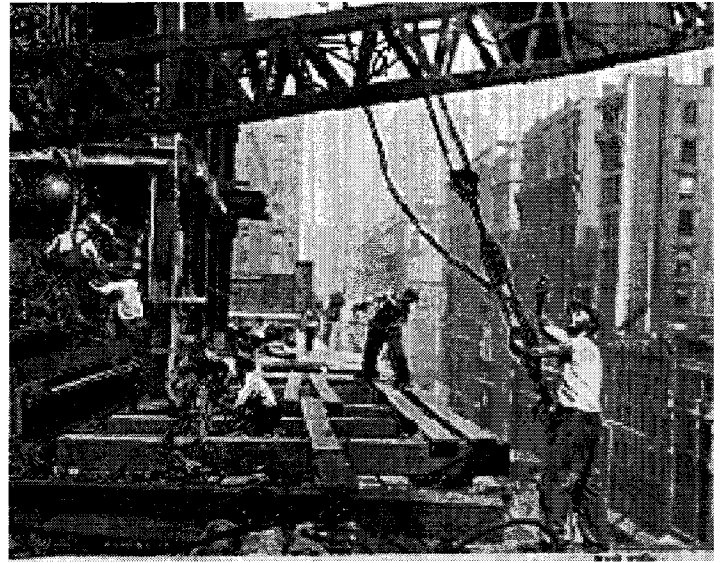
A Hoisting Gang at Work on 34th Street Elevation [Hine (1930): New York Public Library, Javitz Collection].
